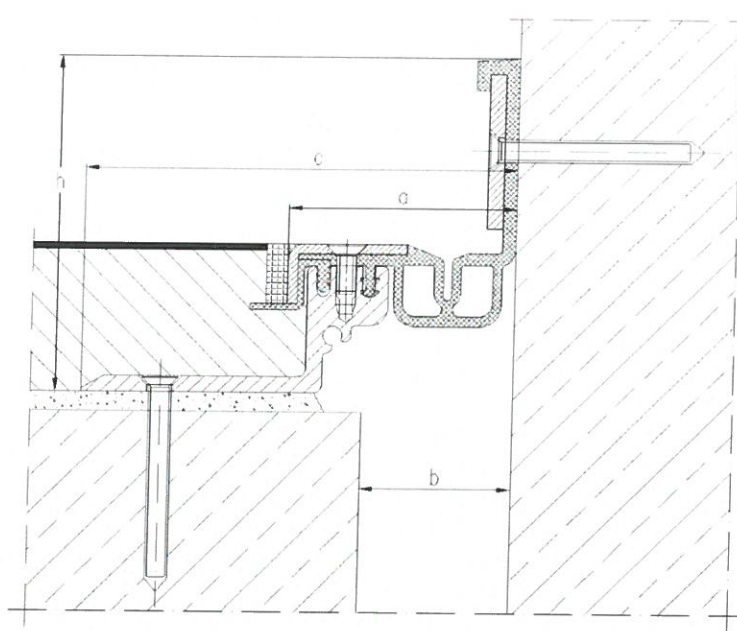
CONECTO PARK GA 50.20.CV S waterproof expansion joint profile
